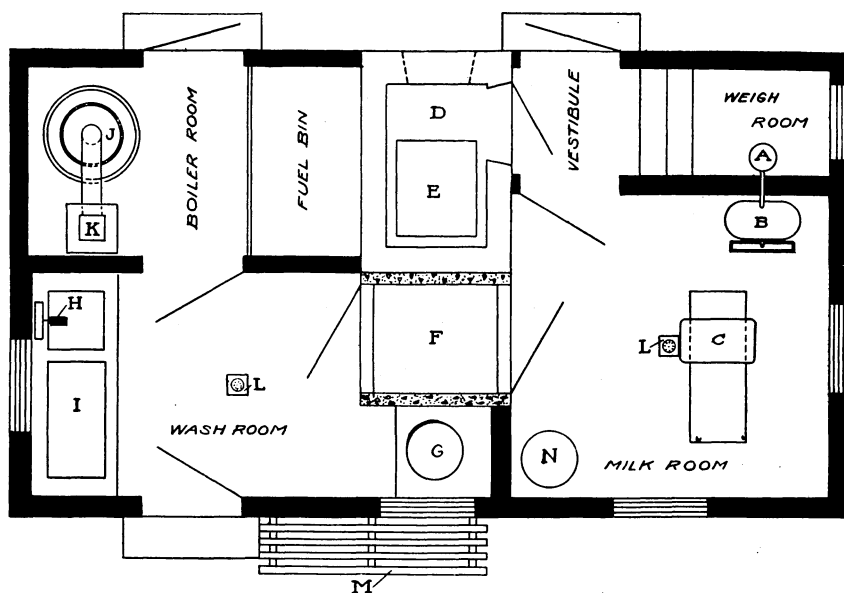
Floor plan of milk house shown in Fig. 58. A, receiving funnel; B, milk cooler; C, bottle filler; D, refrigerator; E, cooling tank; F, sterilizer; G, Babcock tester; H, bottle washer; I, concrete sink; J, boiler; K, chimney; L, floor drains; M, sunning rack; N, separator.
